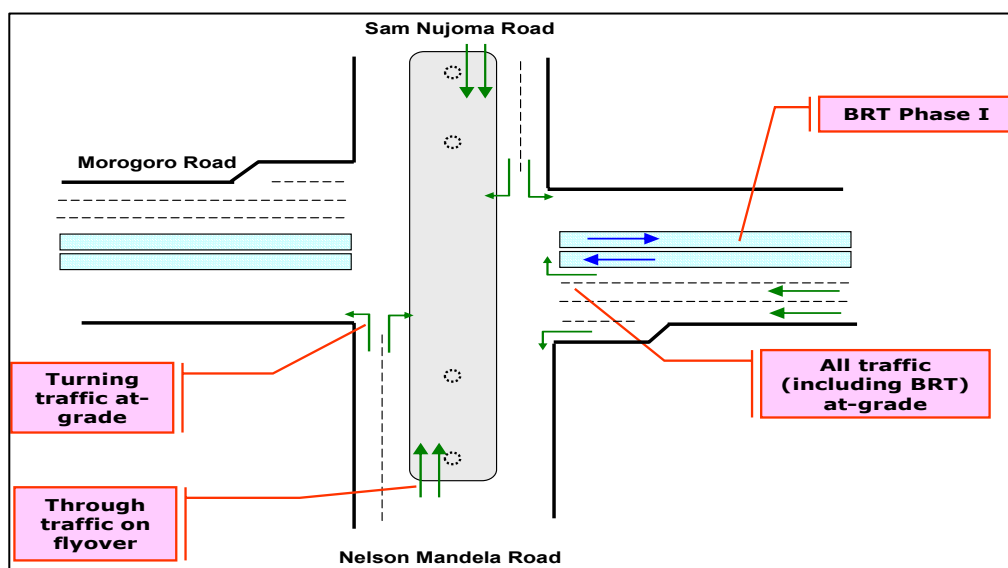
Schematic of Potential Longer-term Solution Single Structure Nelson Mandela Road Mixed Traffic Flyover
